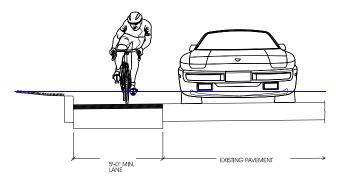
C: TYPICAL CONSTRUCTION PAVEMENT SECTIONS FOR BICYCLE LANES
